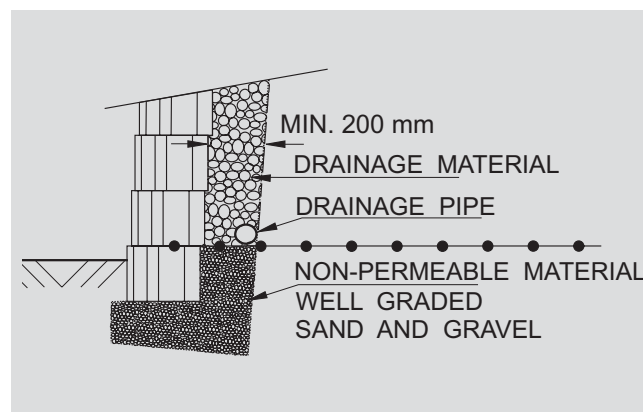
Drainage pipe installation detail above surrounding terrain
